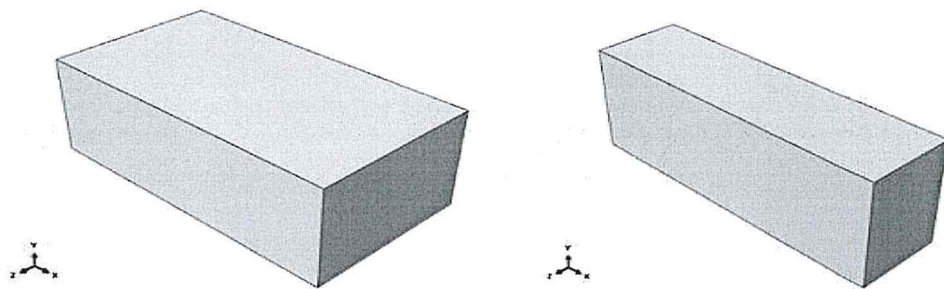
Parts of the masonry infill with 10mm mortar joint (Full and half brick)
